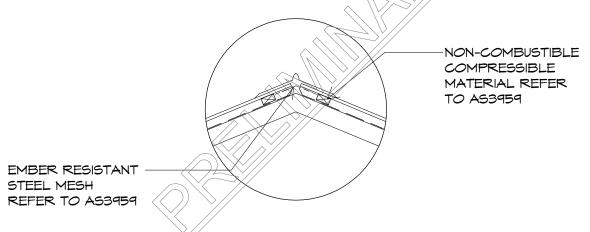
EAVED ROOF WITH EAVE VENT WITH BUSHFIRE CONSIDERATIONS SHOWN
